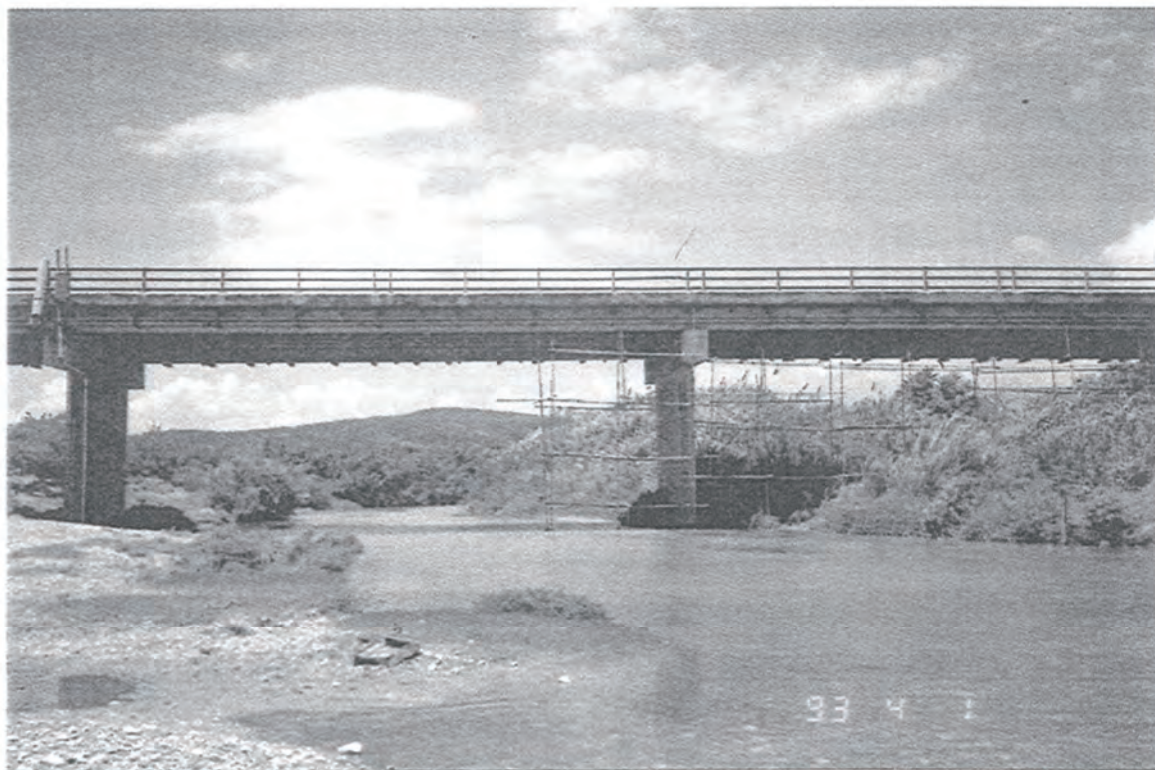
Sampling point 9 - Crum Ewing Bridge.
